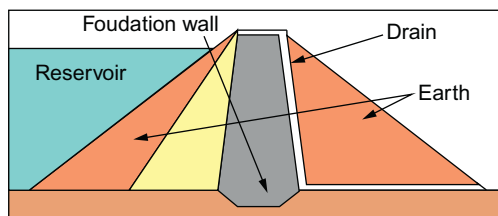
Cross-section of an earthfill embankment dam.
